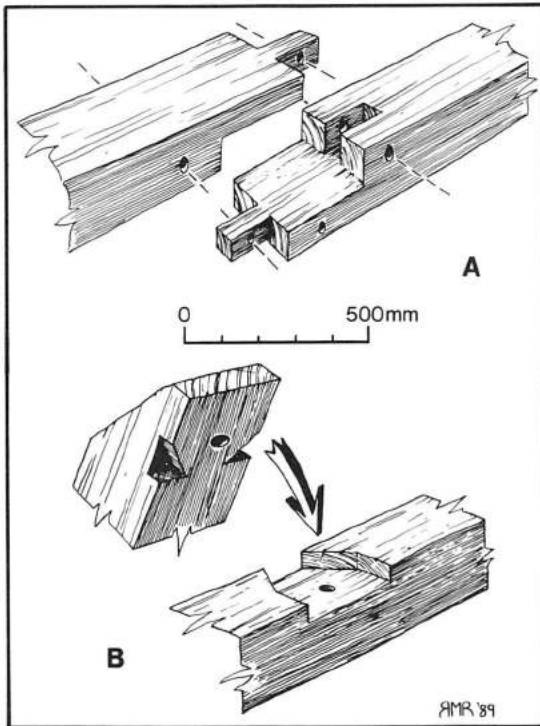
Joints from the Wealden houses: a) edge-halved scarf joint with bridled abutments b) dovetail between tie beam and wall plate
